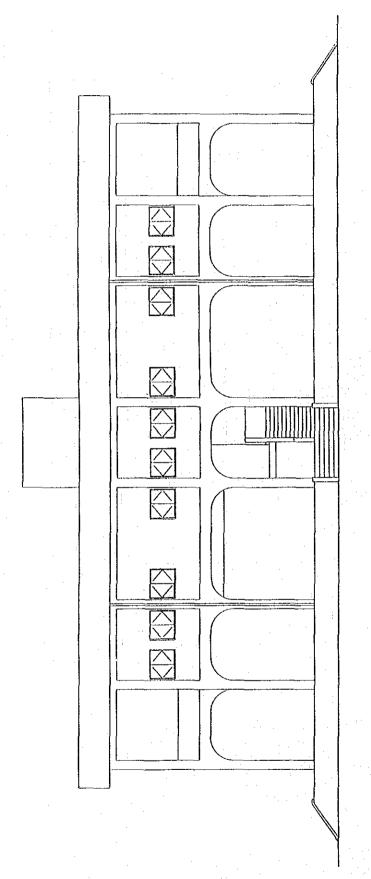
(4) ELEVATION (5-CLASSROOM TYPE)
